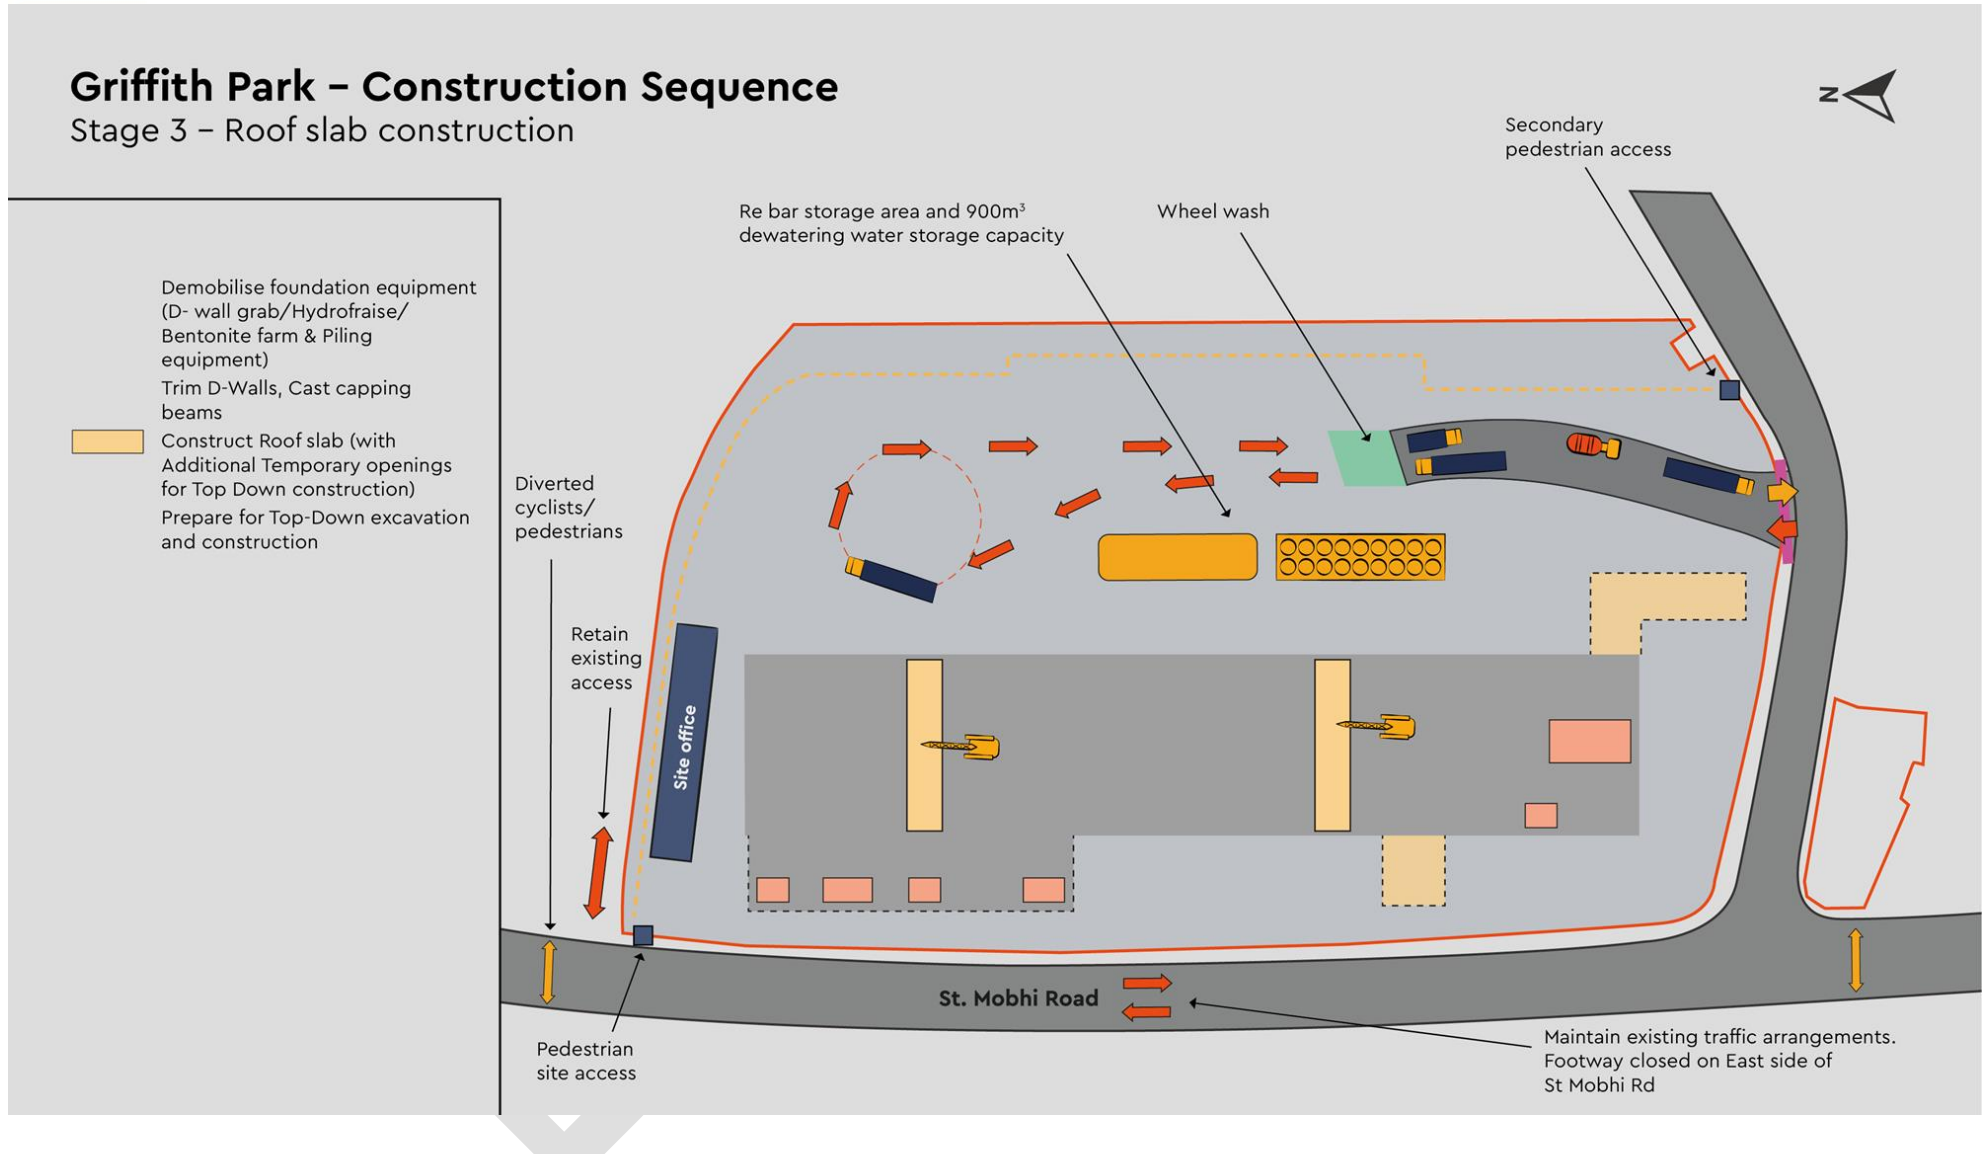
Griffith Park Station Stage 3 Roof Slab Construction
